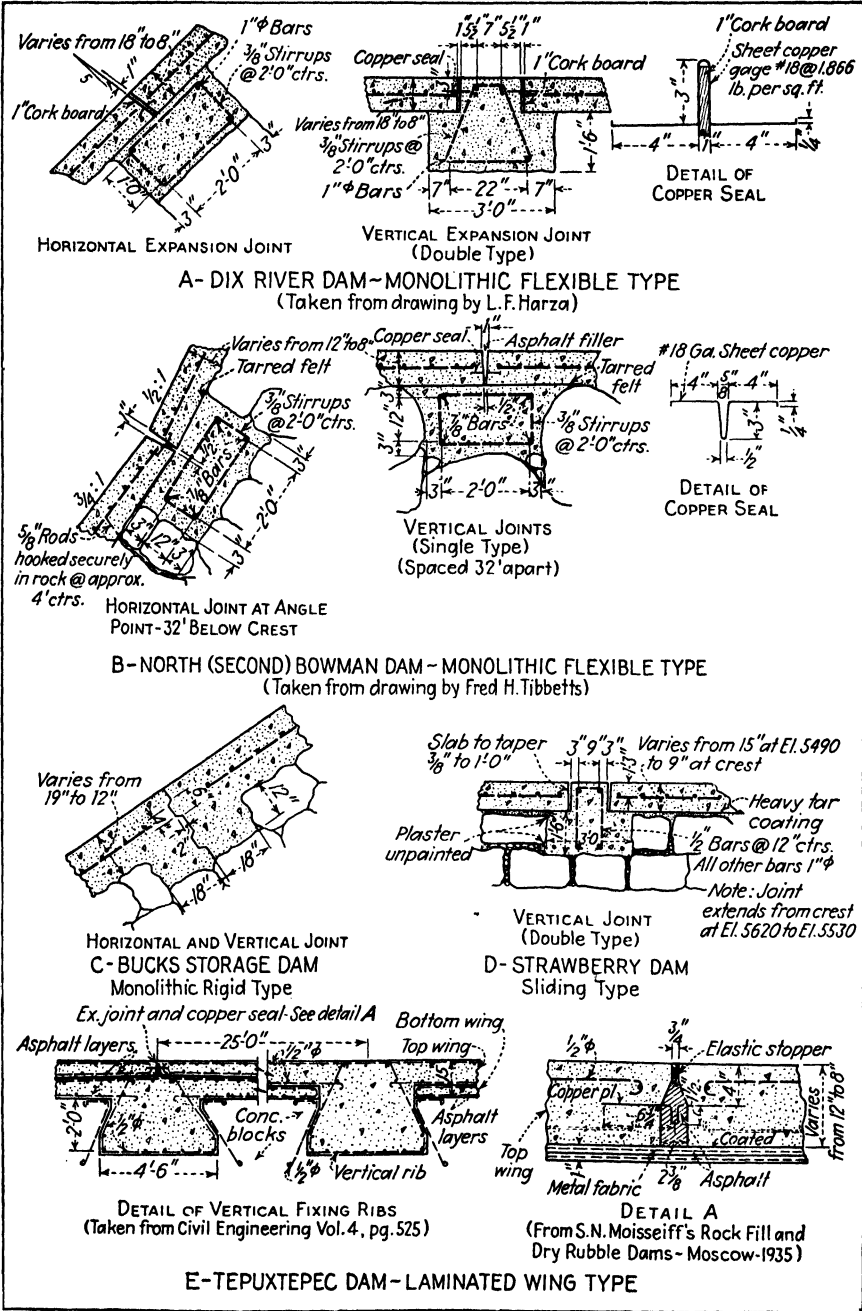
Typical joint details of concrete face membranes of rock-fill dams.
